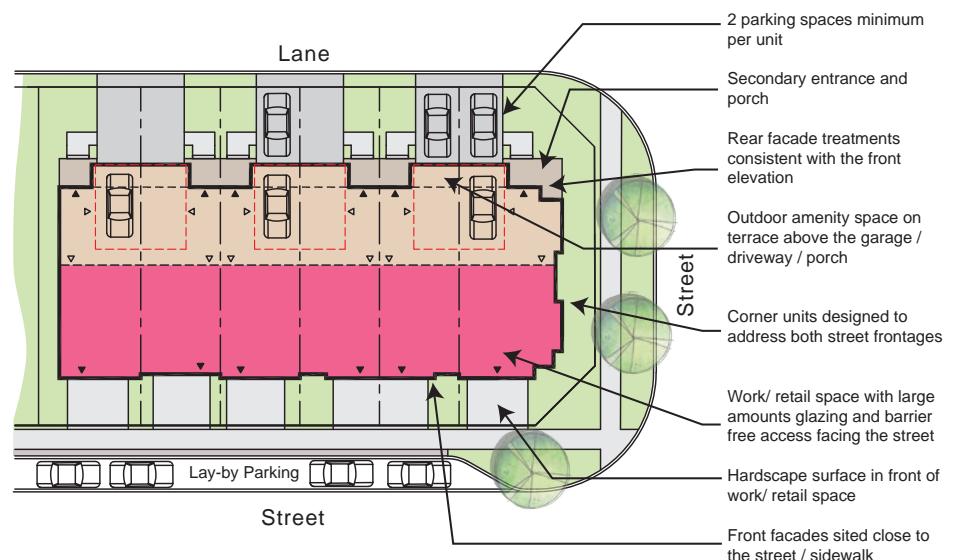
Conceptual plan layout for live-work townhouses
